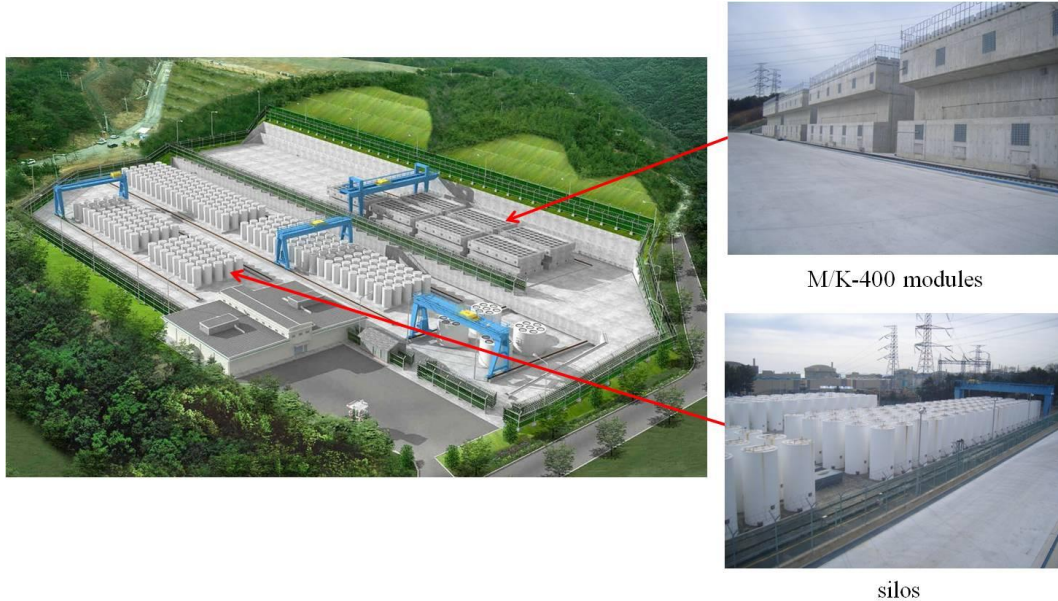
Dry storage facility for CANDU spent fuel at Wolsong site
